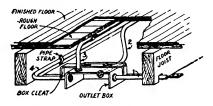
Installing Conduit to Square or Octagon Outlet Box
